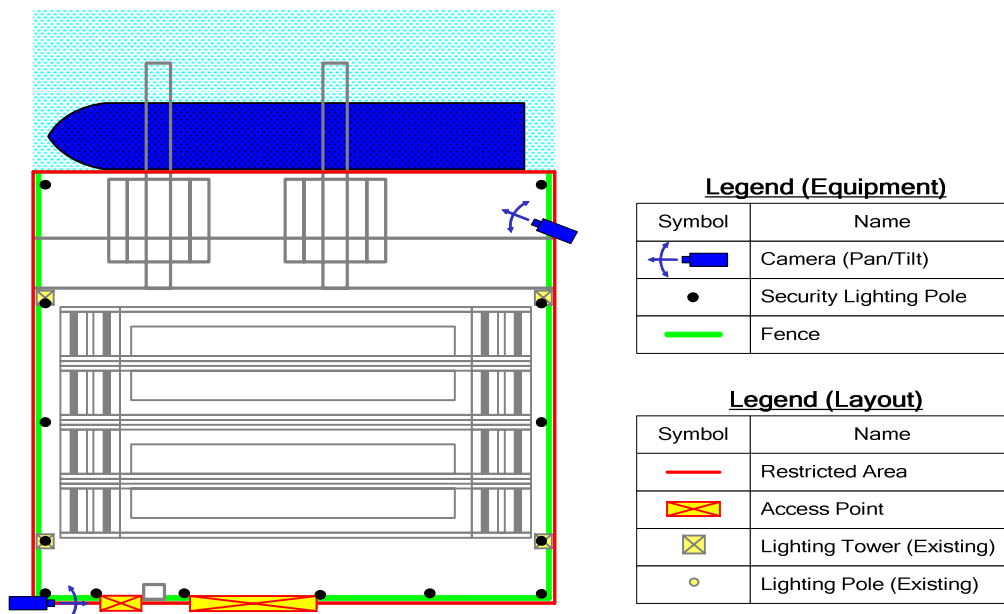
Port Security Facilities Layout Plan for Large and Medium Size Container Terminal
